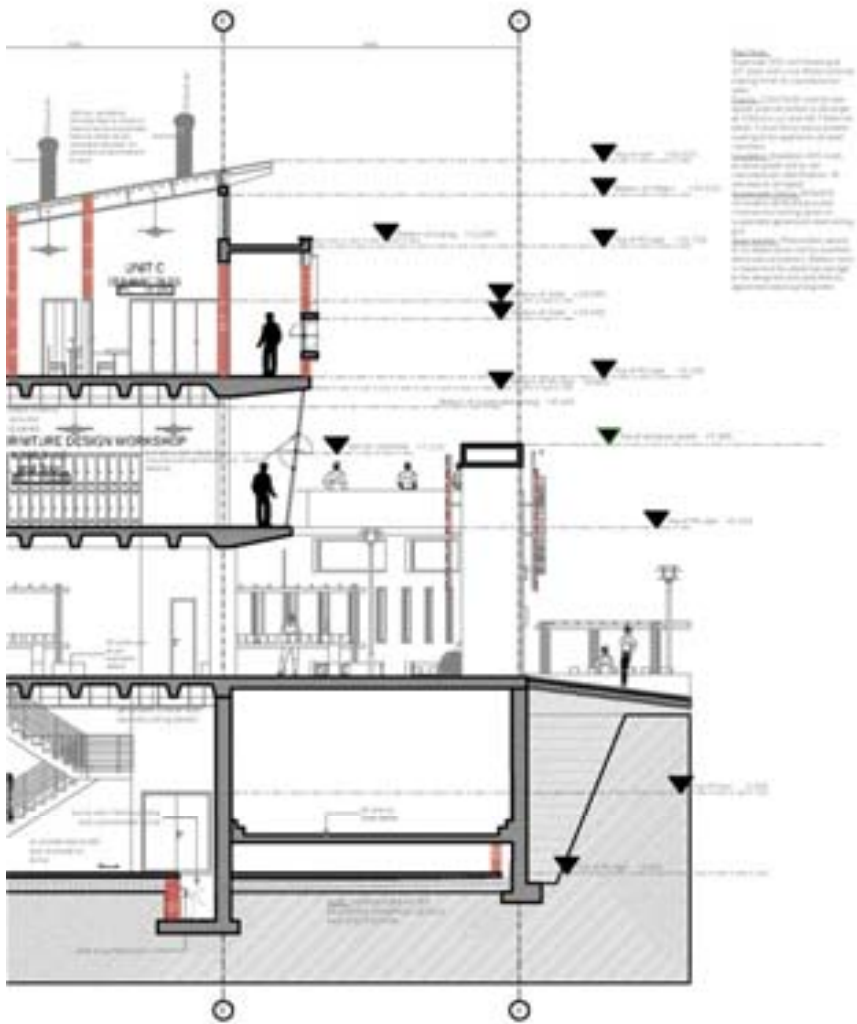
Section A-A. Scale 1:200. (Author, 2009).
